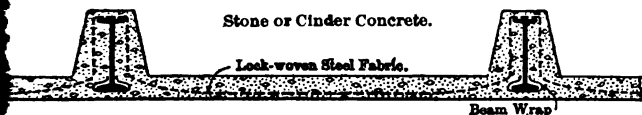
Concrete Ceiling-slab Reinforced with Lock-woven Fabric
